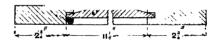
Part Horizontal Section of Bedroom Lavatory Door.
